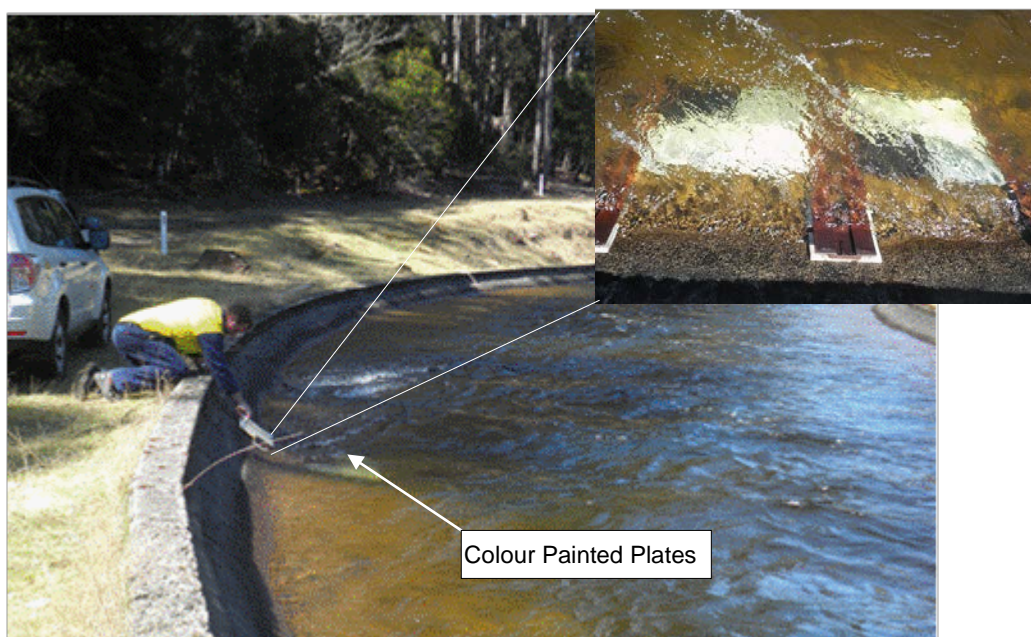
Plates with different colours were located on the concrete wall at Transition 4.
